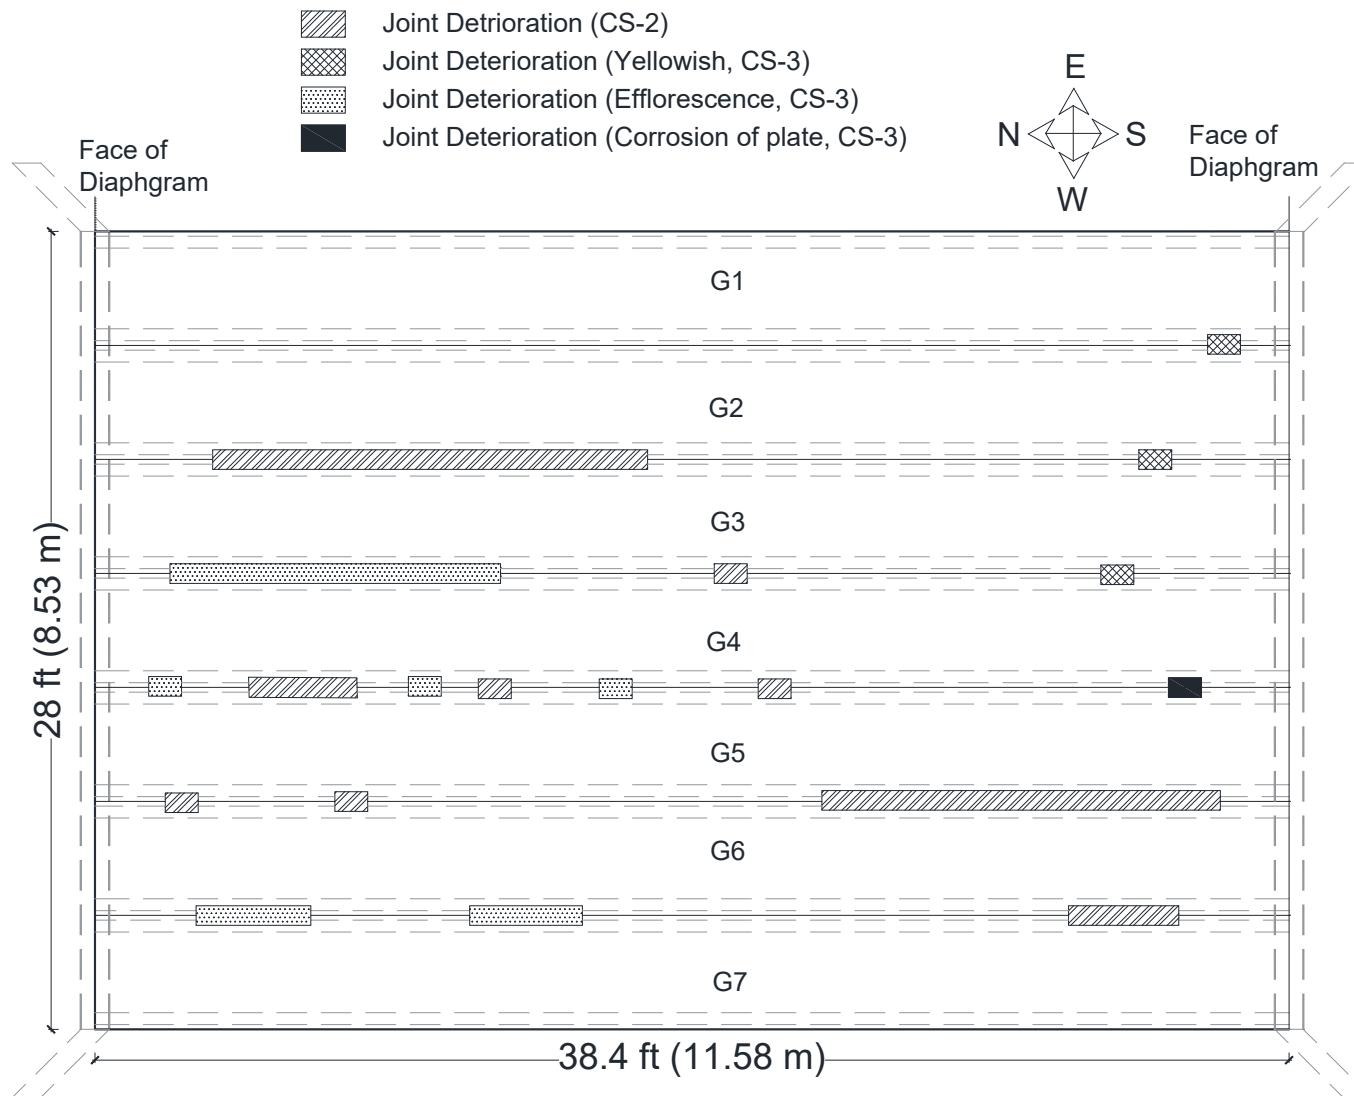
Observed Longitudinal Joint Damage of Field Test Bridge 42-165-153
